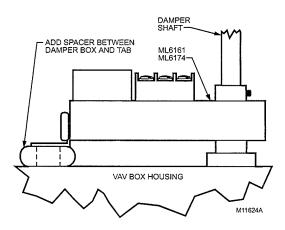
Mounting actuator to VAV box when actuator is not flush with box.
